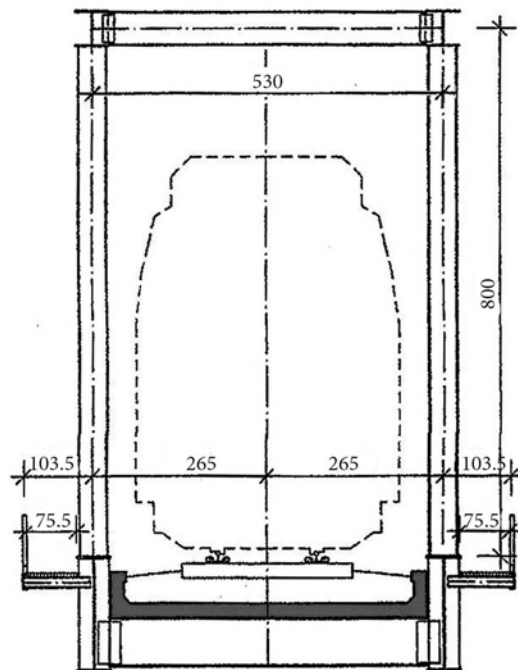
Cross-section of railway bridge span with composite deck (concrete slab shaded)
